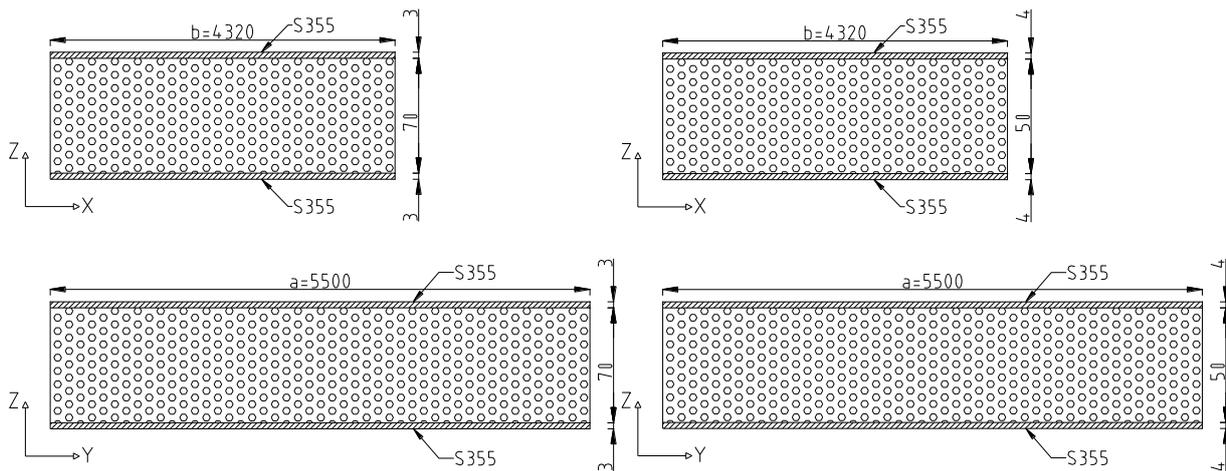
Sandwich Panel with arbitrary configuration 3-70-3 and 4-50-4
